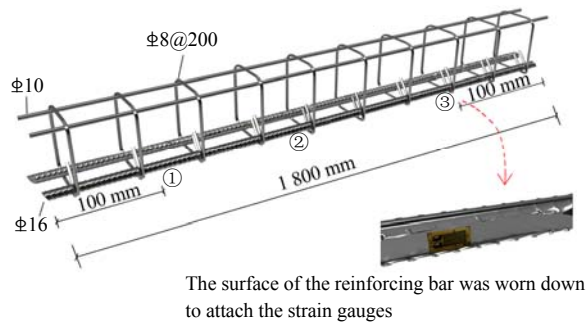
The location of strain gauge in steel cage (unit: mm)
